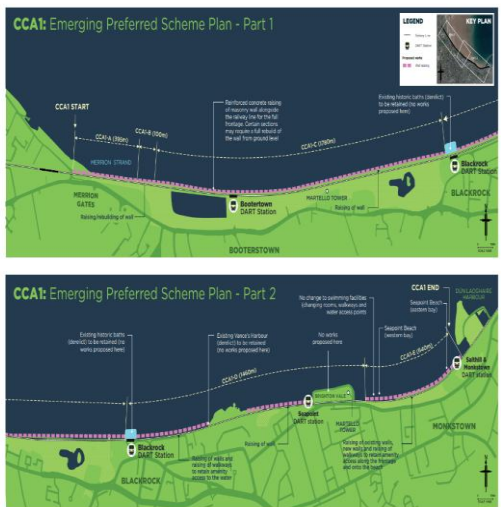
CCAI Emerging Preferred Scheme Plan - Parts 1 & 2
